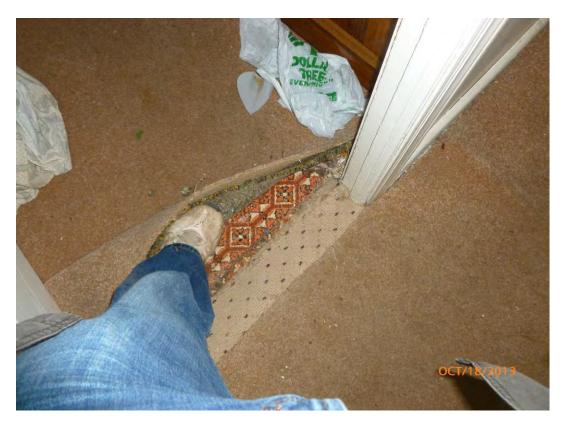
$-2^{\rm ND}$ Floor Bedroom: Red linoleum (<u>note:</u> identified to be non-ACM).
